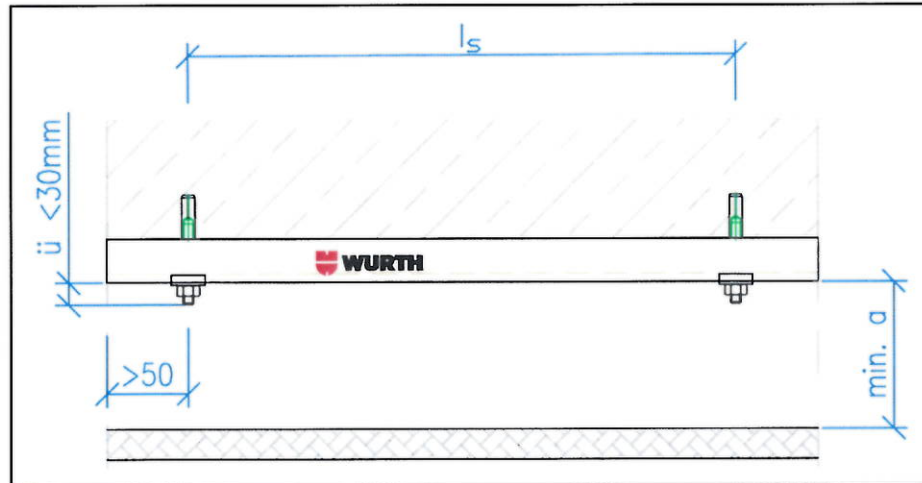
Schematic diagram showing the use of Würth rail systems in areas above suspended ceilings of relevance to fire protection requirements
